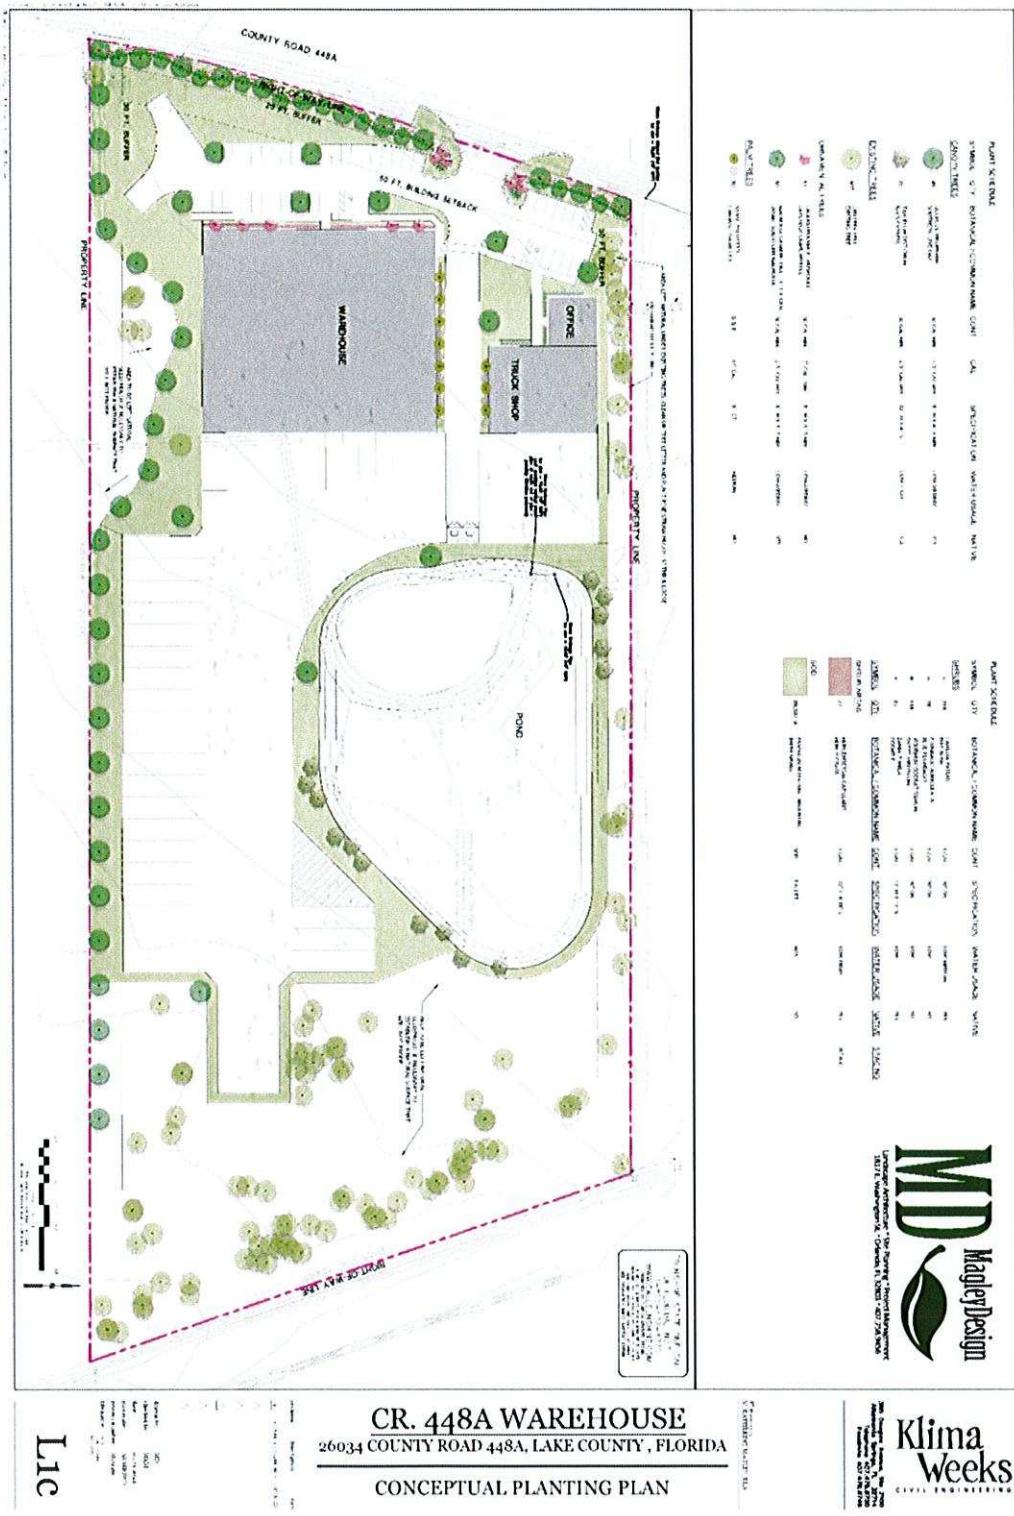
EXHIBIT "A" – CONCEPTUAL PLAN (2 of 2)
